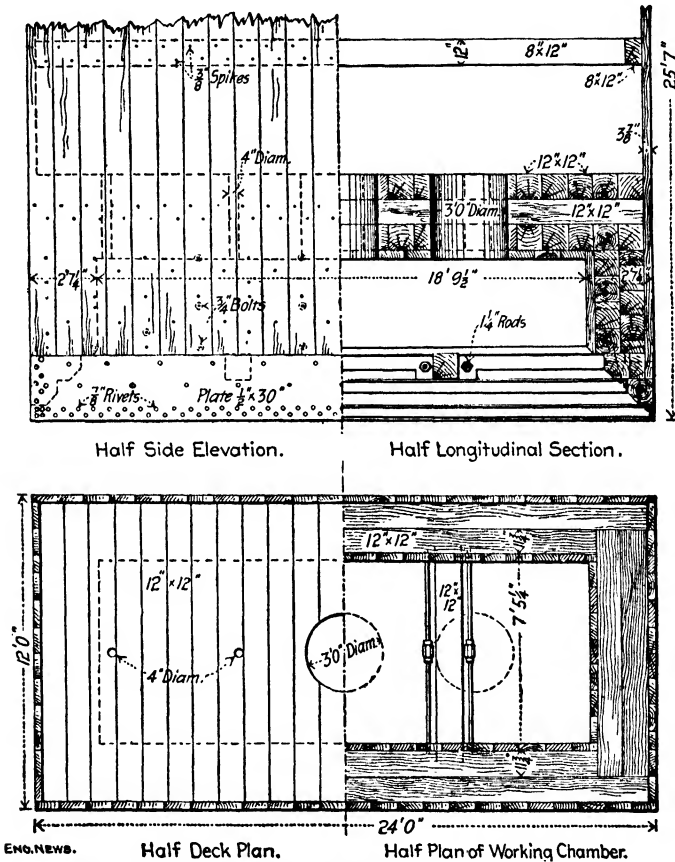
Pneumatic Caisson of Timber Construction.
